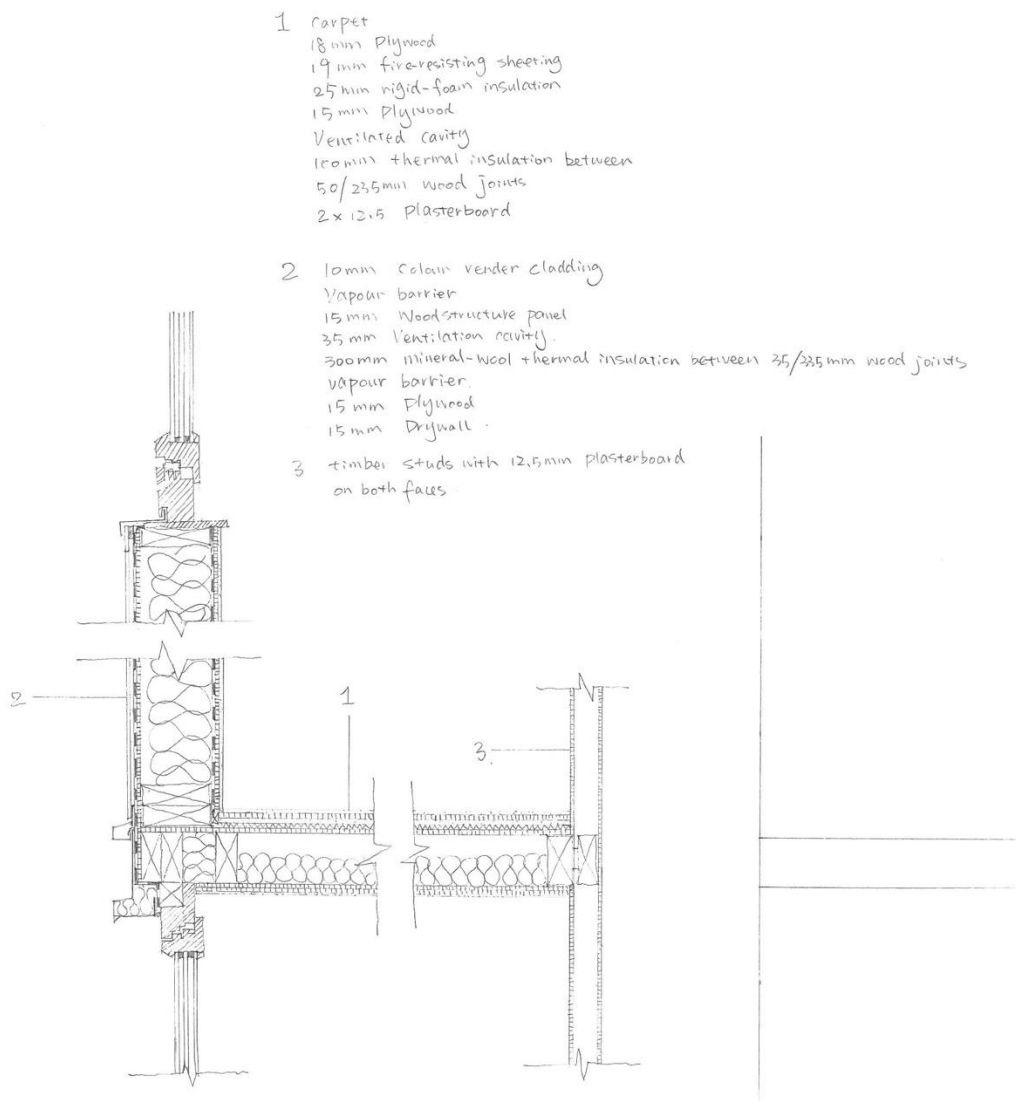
Detailed drawing for low carbon fitting: floor insulation and window joint
